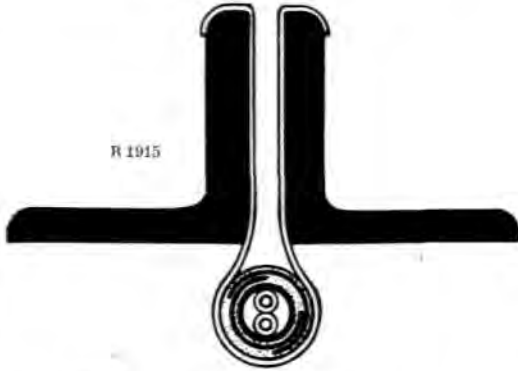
Cable suspended in a roof-truss by a strip of hoop iron.
